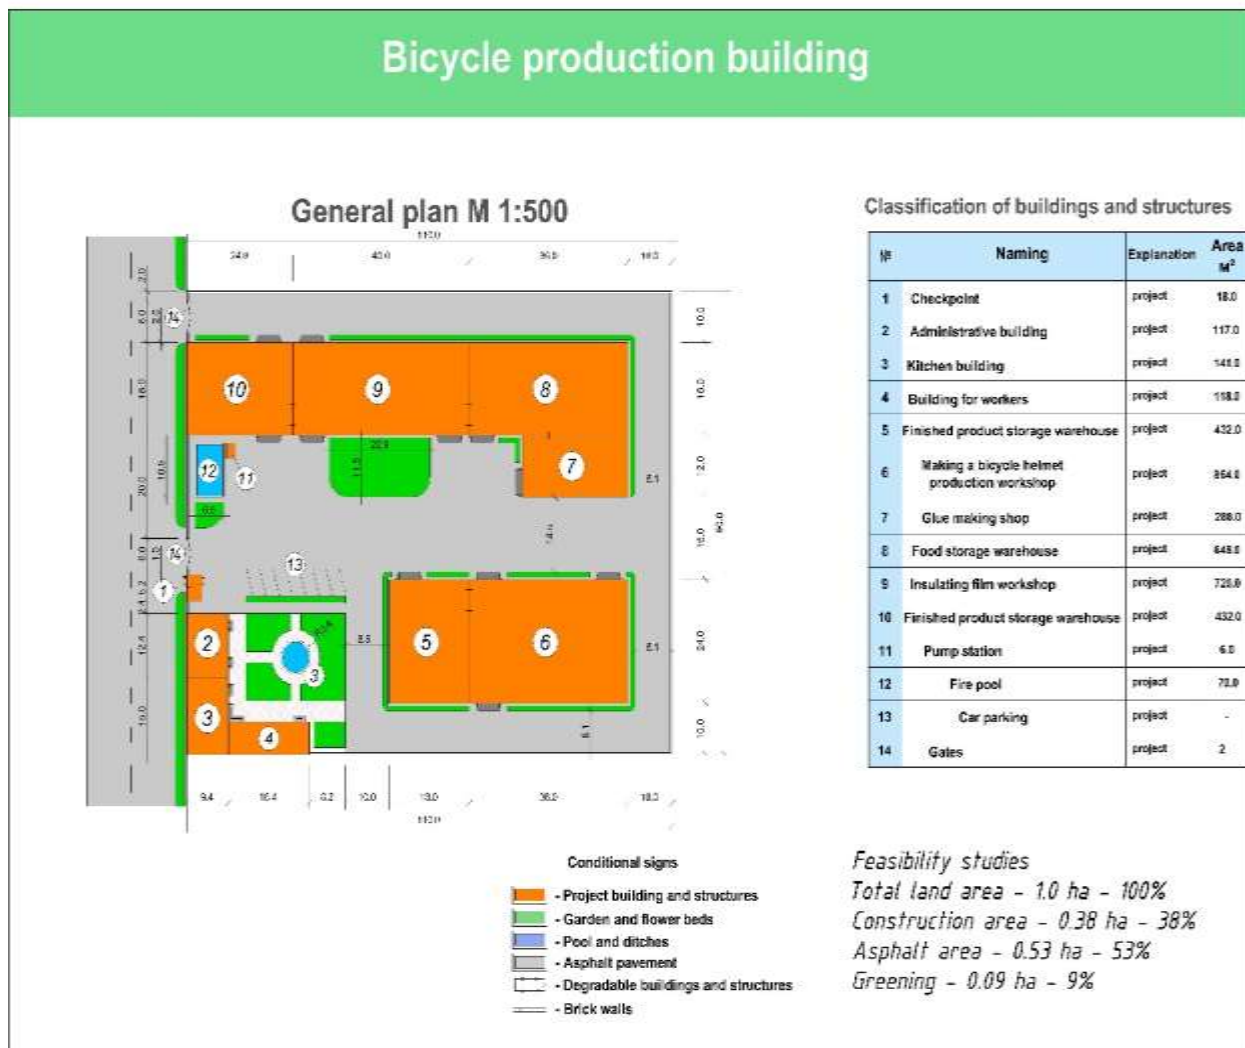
General plan of the bicycle production industrial building. General plan of light industrial buildings and its room classification solutions (Fig. 4). In the production department, a gatehouse, a shop, and sanitary facilities were designed.
